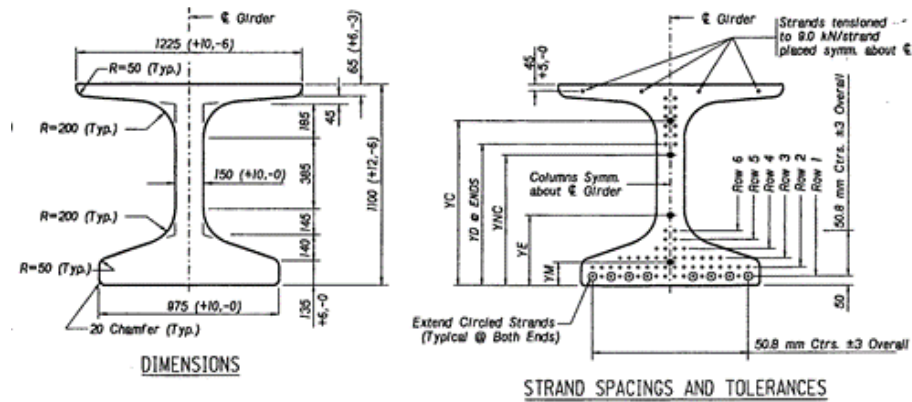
Girder dimensions and strand distribution, from the construction documents of Schuyler Bridge, courtesy of NDOT
